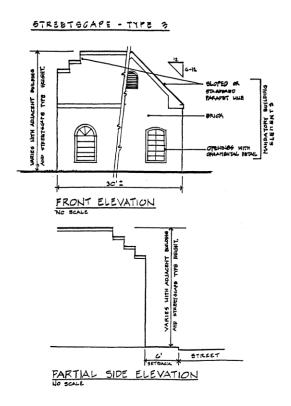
BRICK STRUCTURES DISTRICT-STREETSCAPE, TYPE 3
